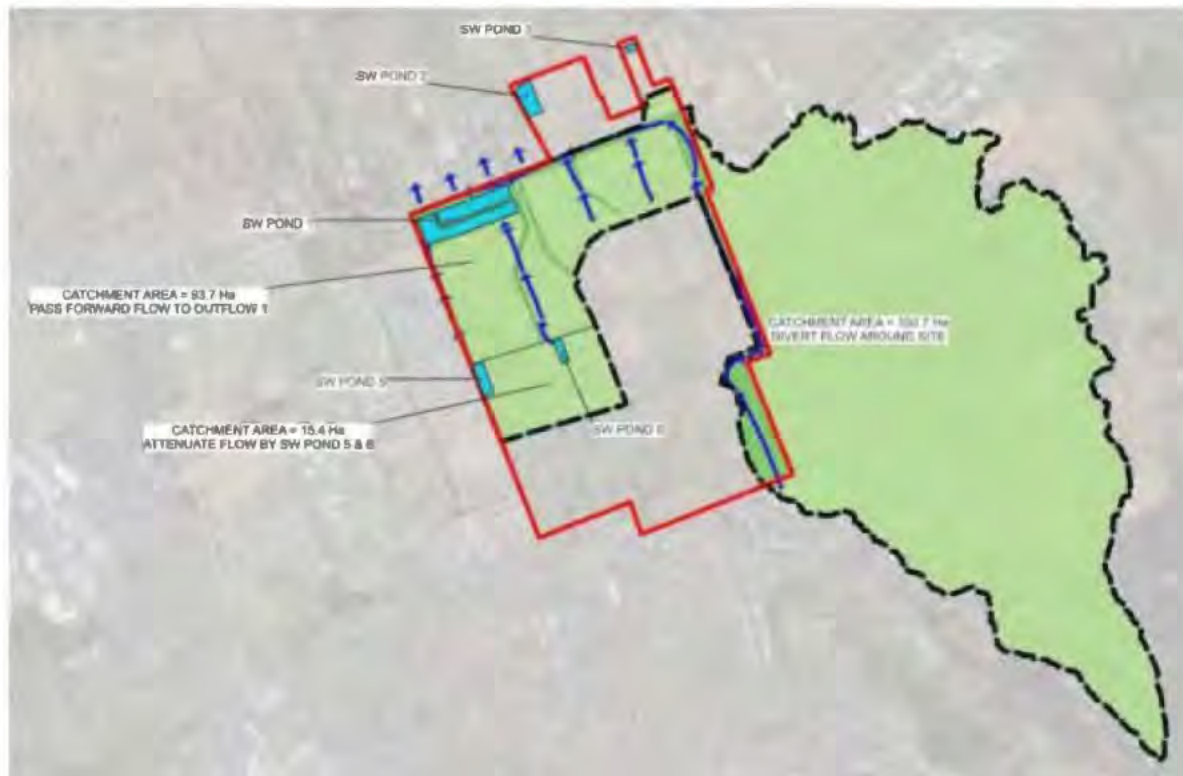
Proposed Stormwater Pond 1 Catchment
